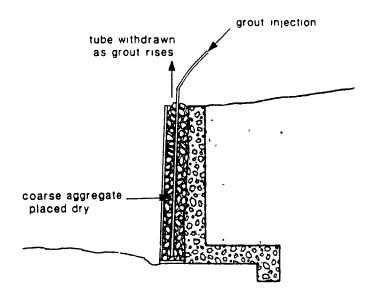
PREPLACED AGGREGATE CONCRETE REPAIR TECHNIQUE<sup>2</sup>
